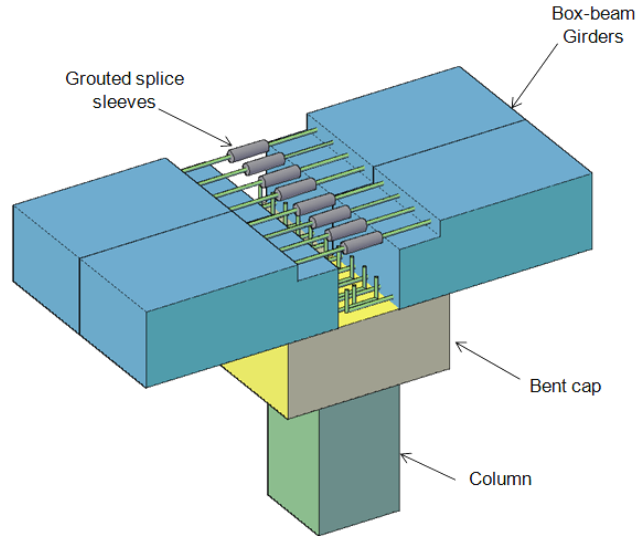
Continuity detail at pier using splice sleeves (Source: Culmo 2009)
